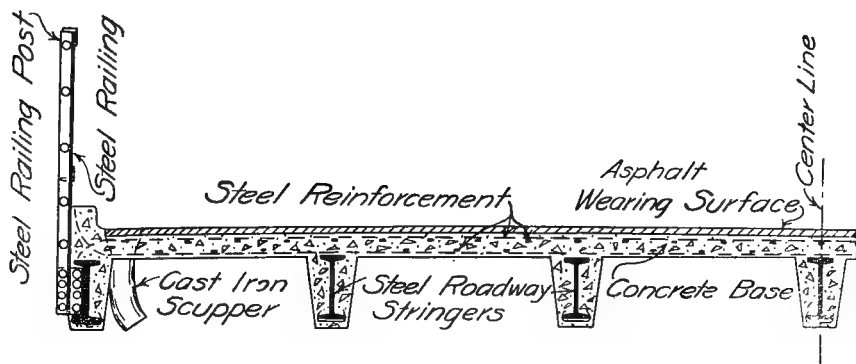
REINFORCED CONCRETE ROADWAY FOR STEEL SPANS.
